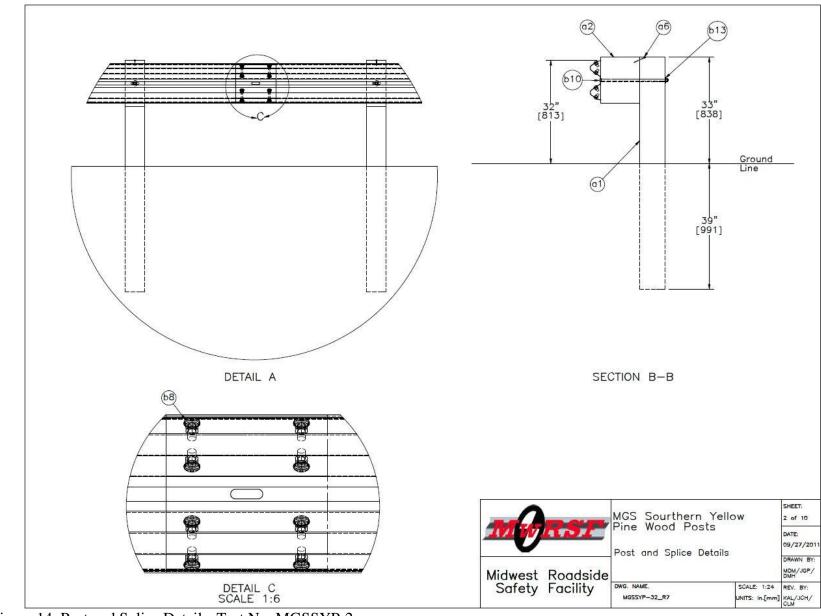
Post and Splice Details, Test No. MGSSYP-2
